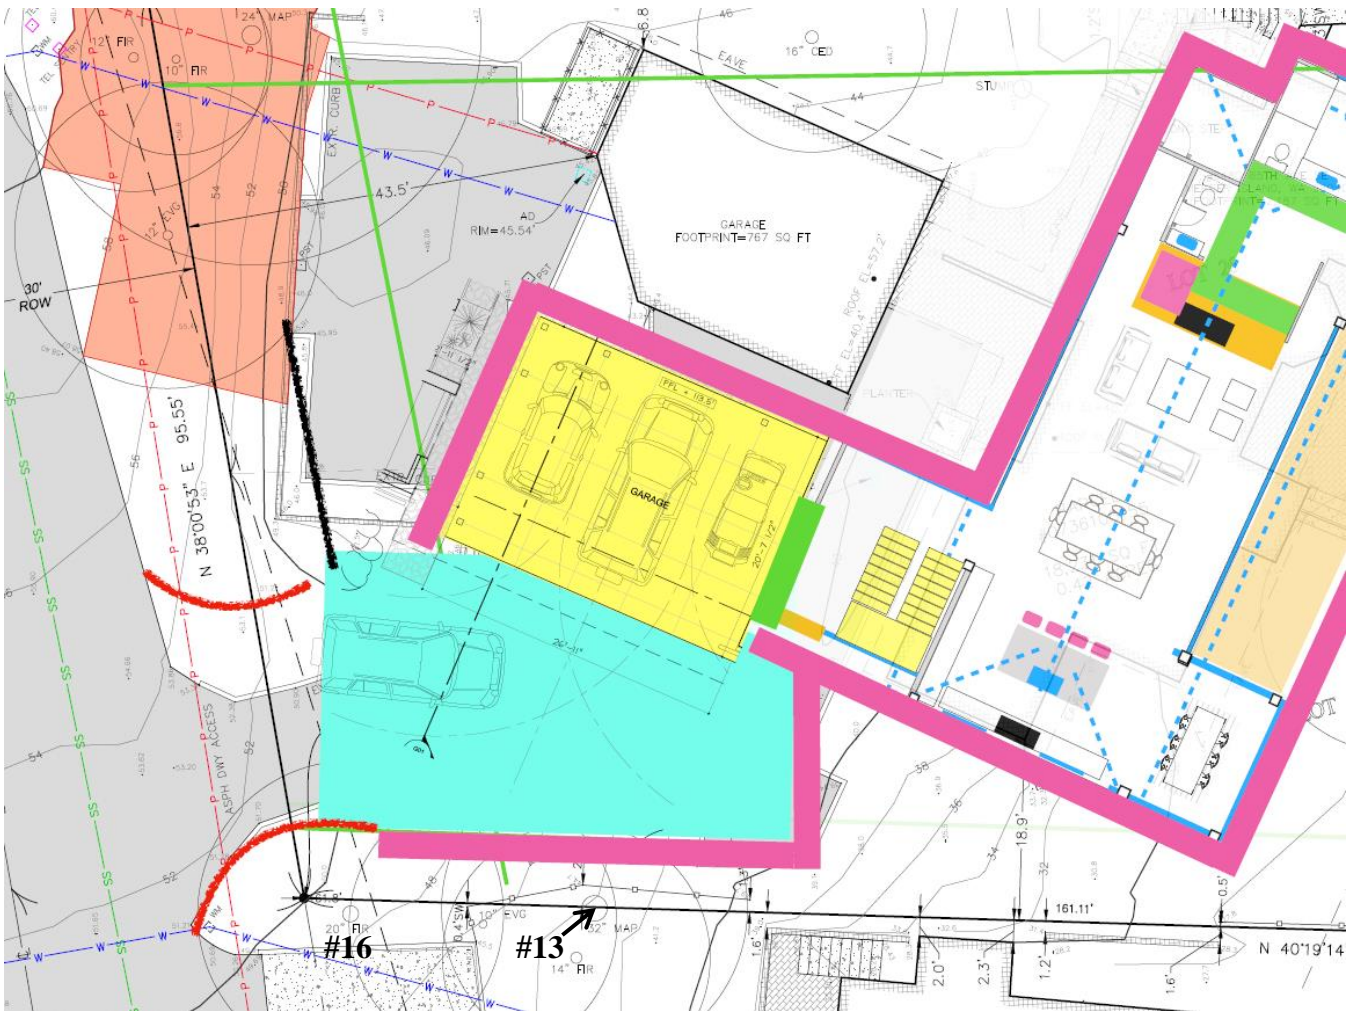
Conception sketch of the proposed new home and driveway entrance. The heavy pink border represents the excavation limits. Tree #13 and #16 are noted to bring clarity of impact potential to the fore. The excavation cut will be as close as 4' to the #13 and 5' to the #16. This is within the 10' SRP non-intrusion region for the maple and the 9' SRP for the fir. Neither would survive this damage long term and both are likely to fail catastrophically in the short term.
